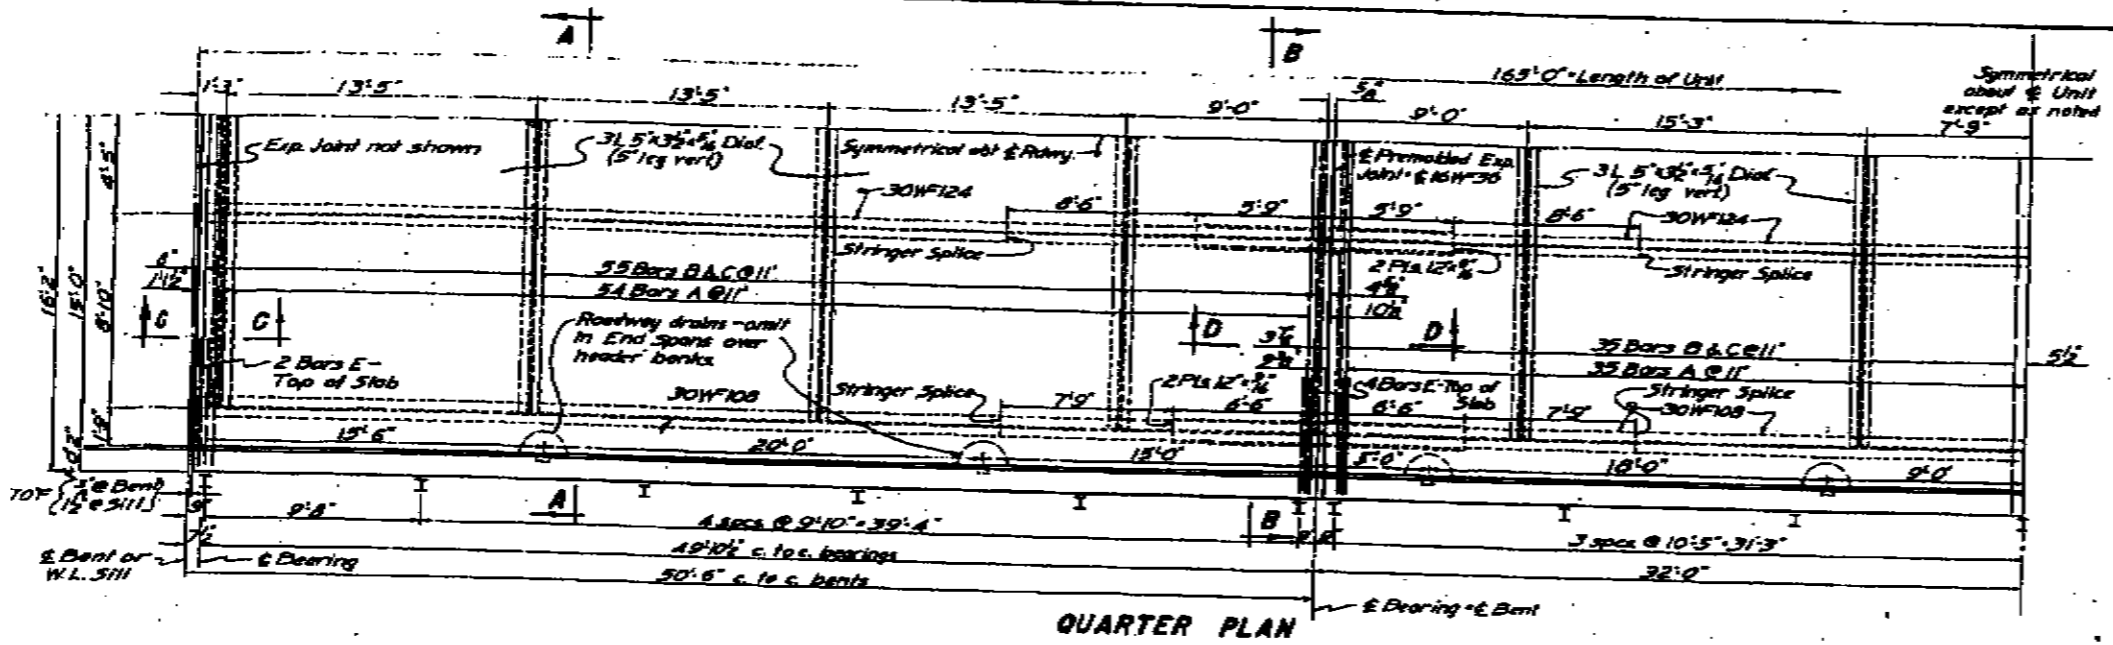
DETAILS FOR STANDARD I-BEAM VIADUCT COMPOSITE SECTION 30'-0" ROADWAY 44'-0" SPAN SOUTH DAKOTA
